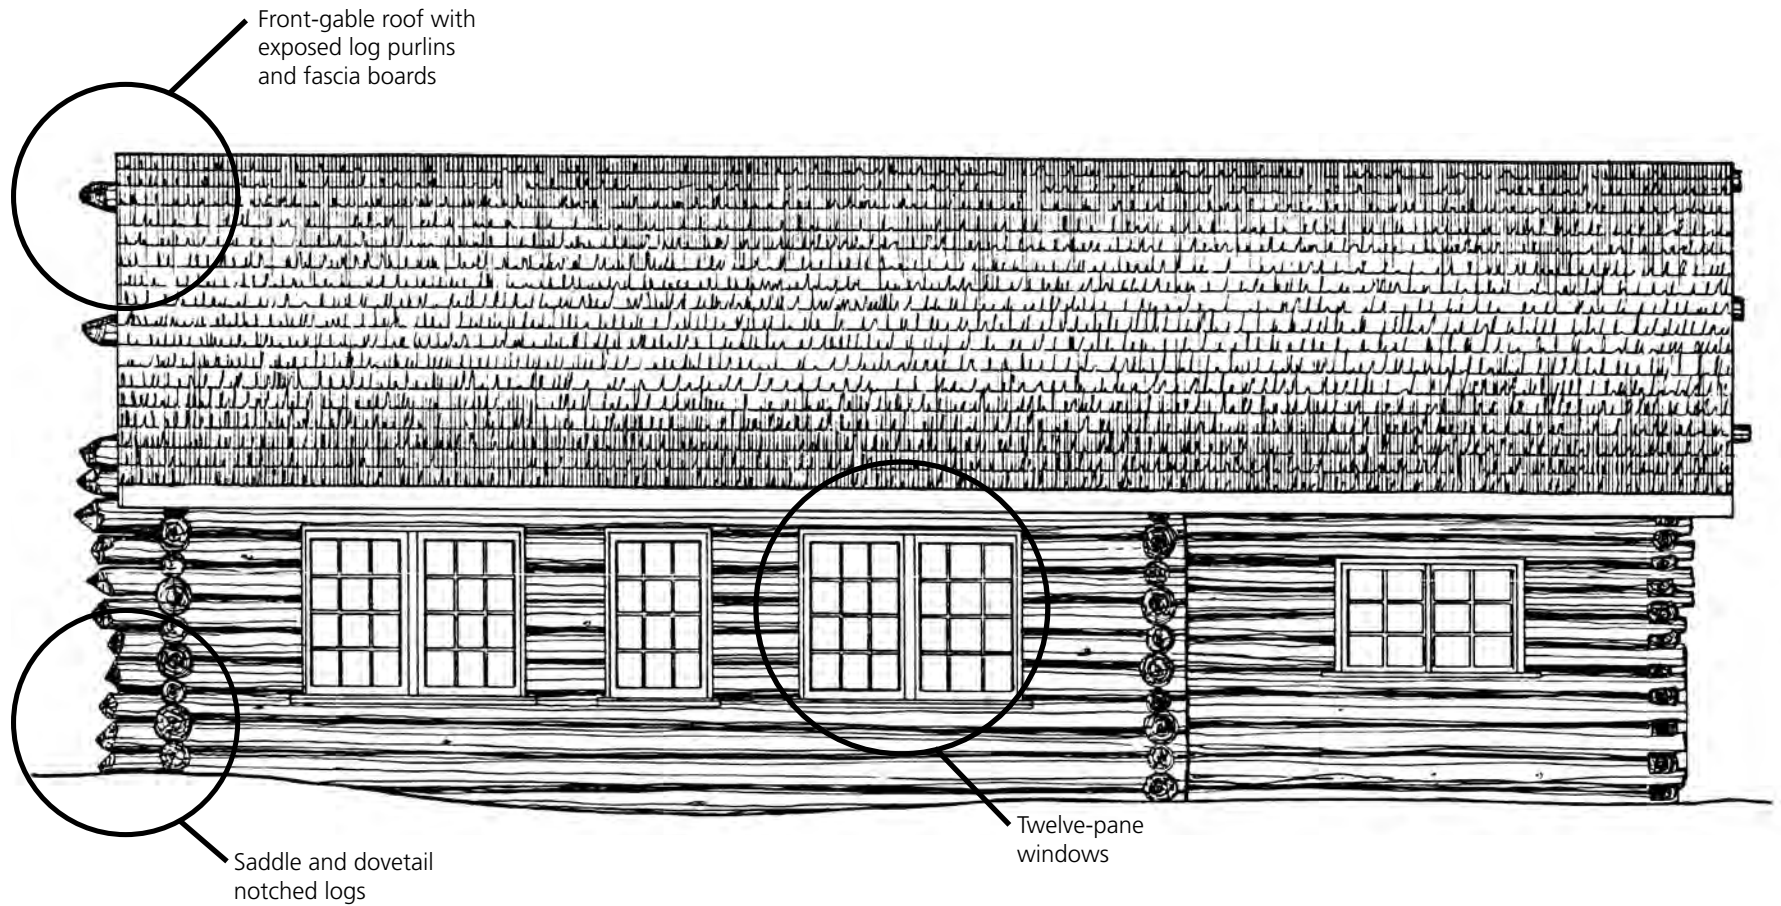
Building 106, South Elevation, Historic American Building Survey, National Park Service, W. Vandeventer and Dave Snow, 1986 (NPS Alaska Regional Office Files)
